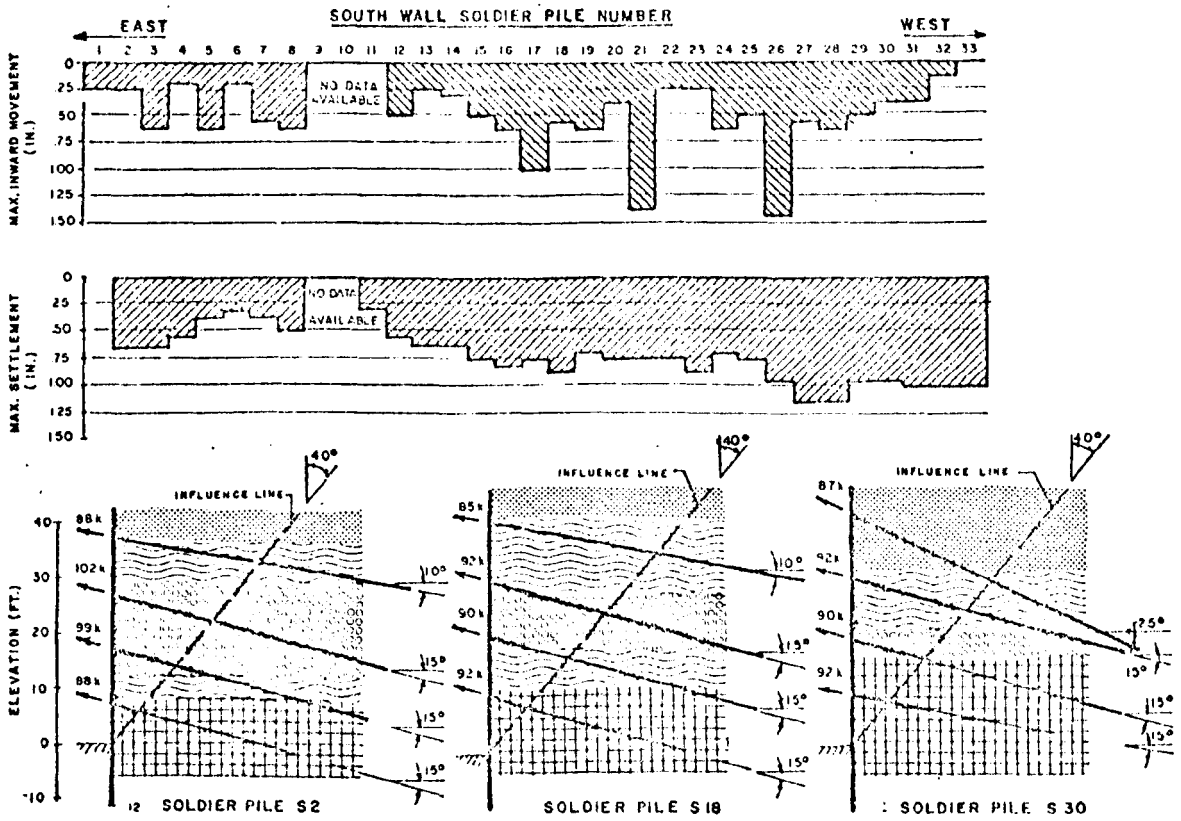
PILE MOVEMENT AND TIEBACK LOCATION-SOUTH WALL
